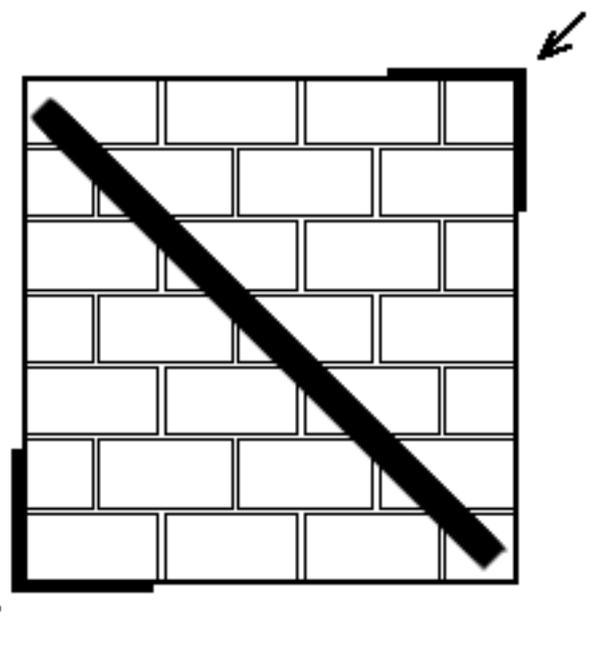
Test arrangement for diagonally reinforced panels under monotonic loading (MD).
